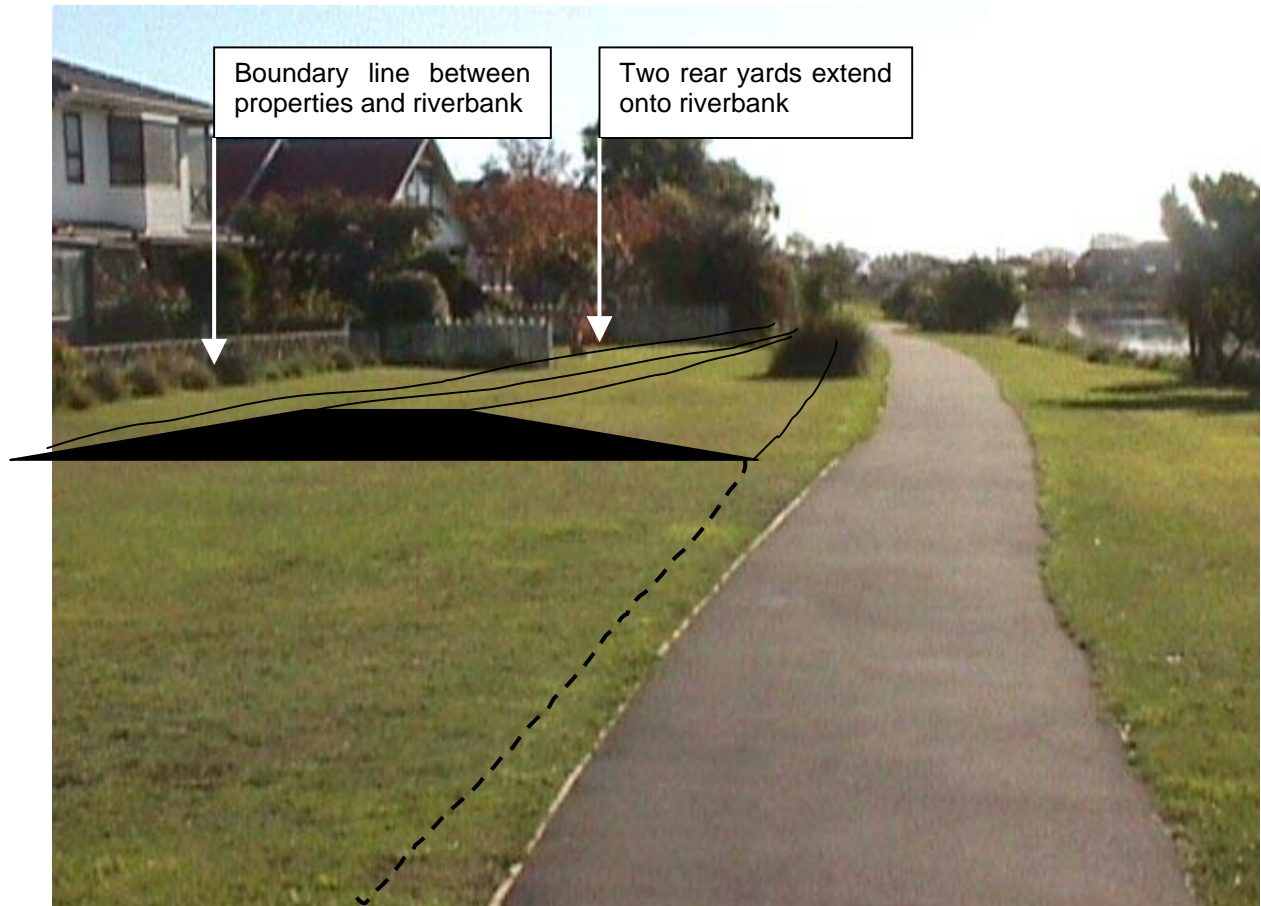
View indicating proposed stopbank placement behind 2-18 Hulverstone Drive
